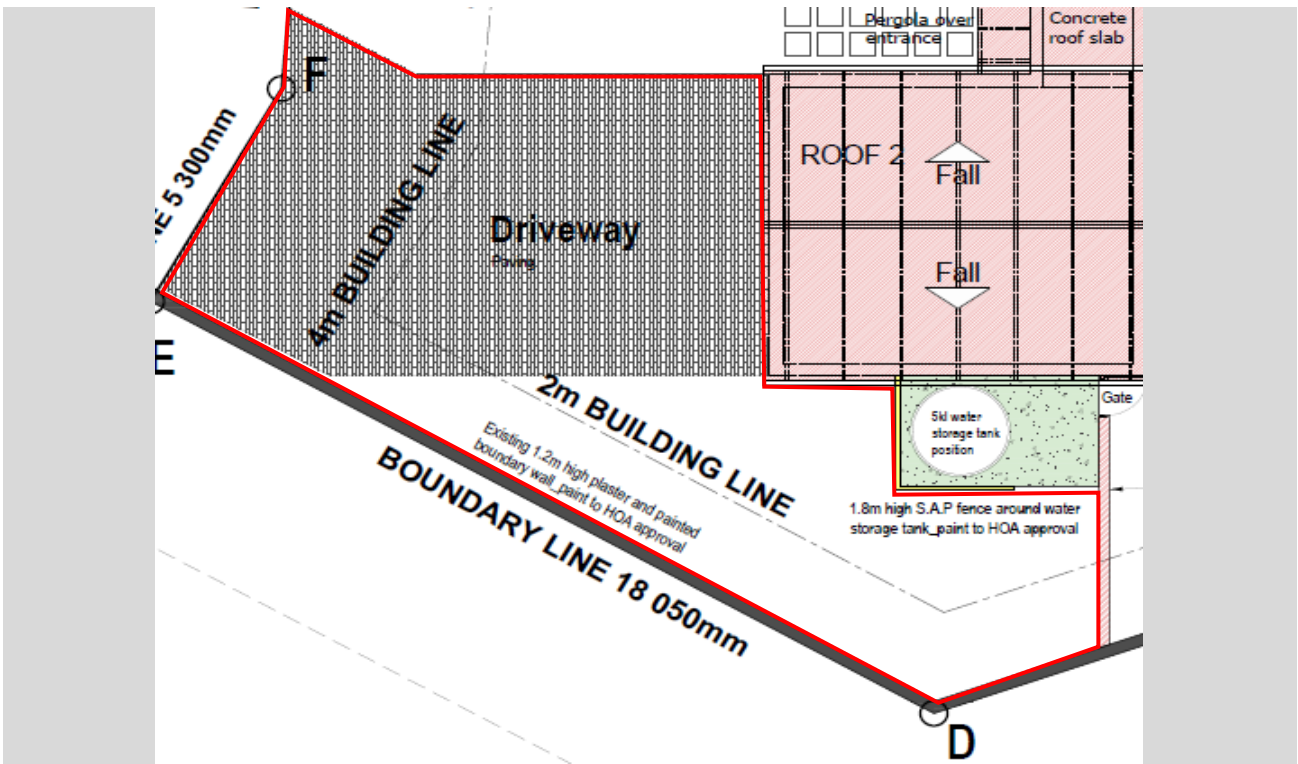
Area to be used as temporary Site Camp, material laydown area etc. during construction, indicated by red polygon.
